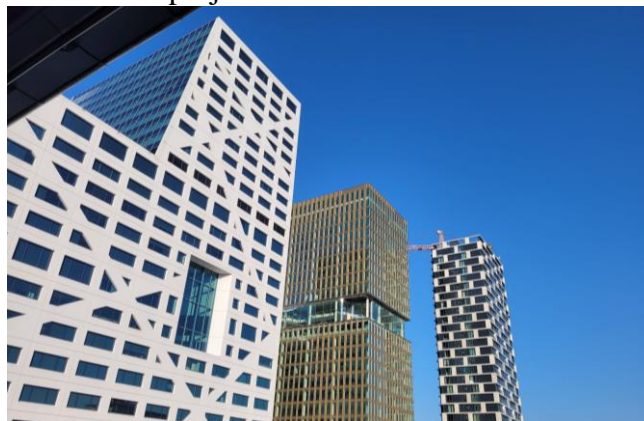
Central Park building (middle) under construction (own photo, 2021)
